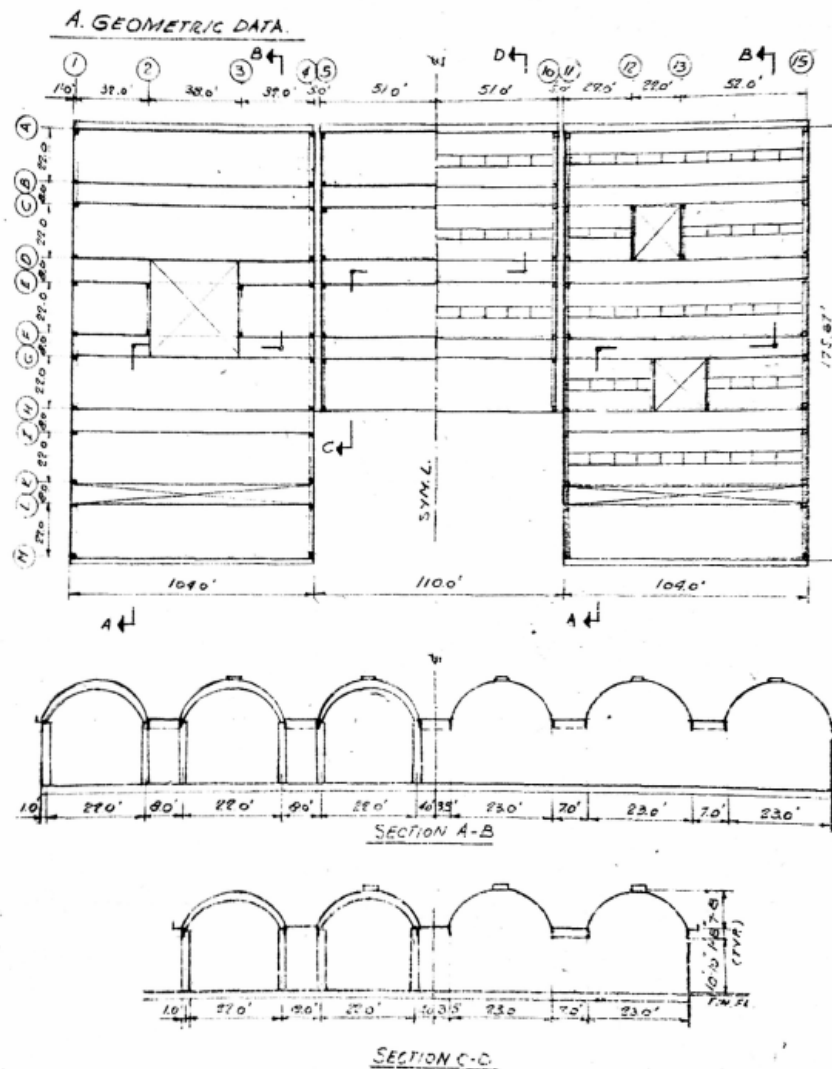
Plan and elevation view of the Kimbell Art Museum (Komendant, 1970
